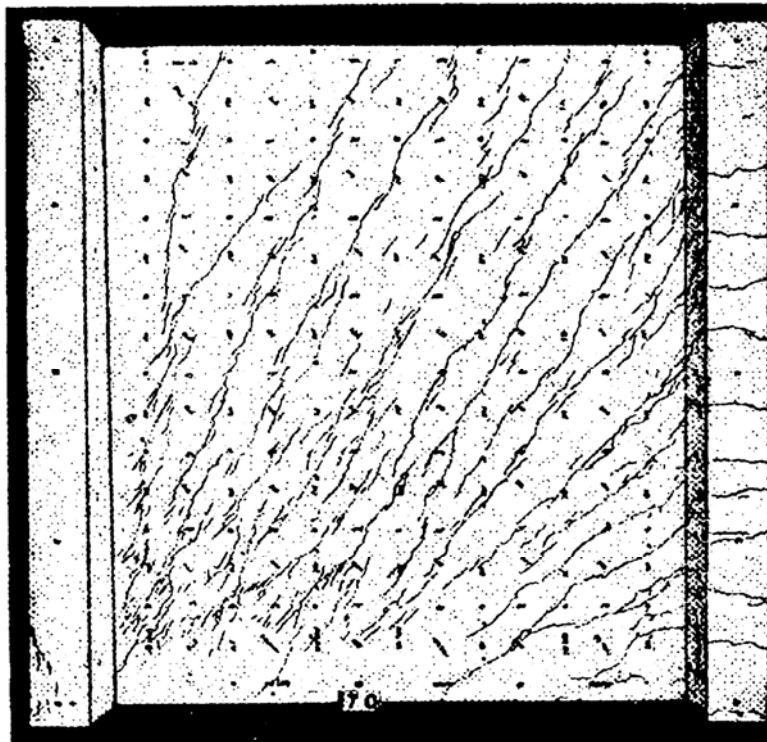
Cracking pattern for wall S2 tested by Maier and Thürlimann (1985) at first yielding of flange vertical reinforcement
